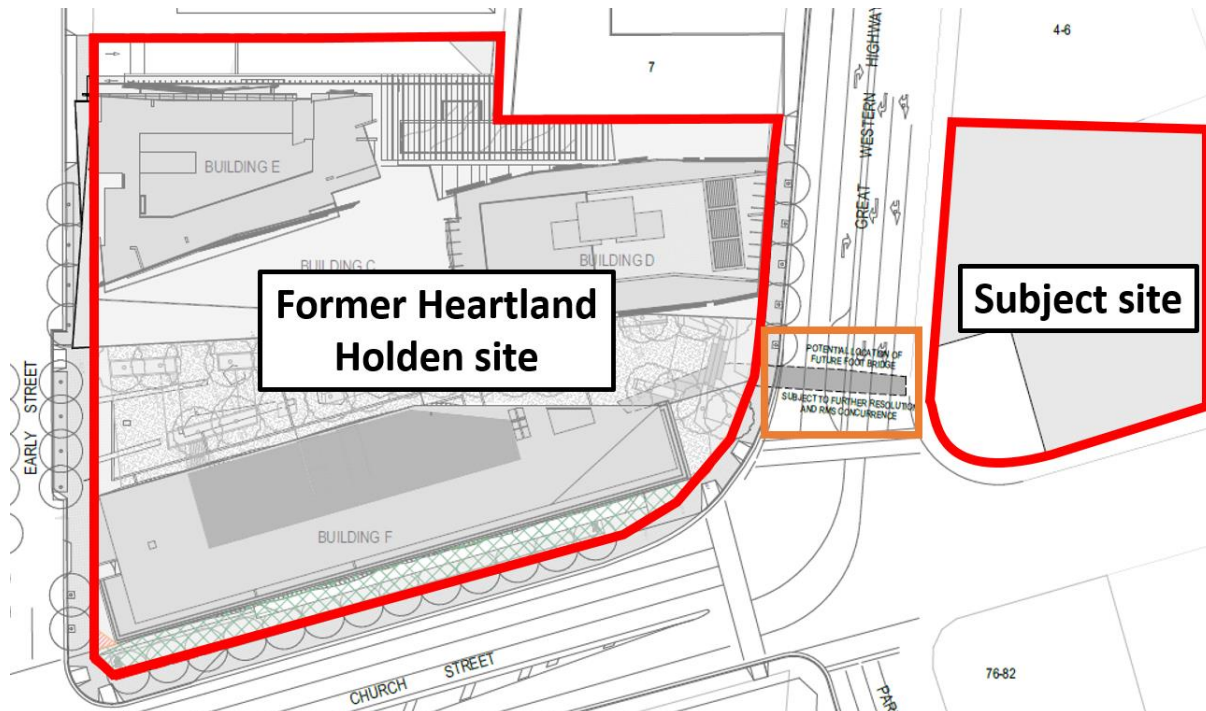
Location of Former Heartland Holden site, indicative location of future pedestrian bridge (in orange – subject to future DA and RMS approval), and subject site.
